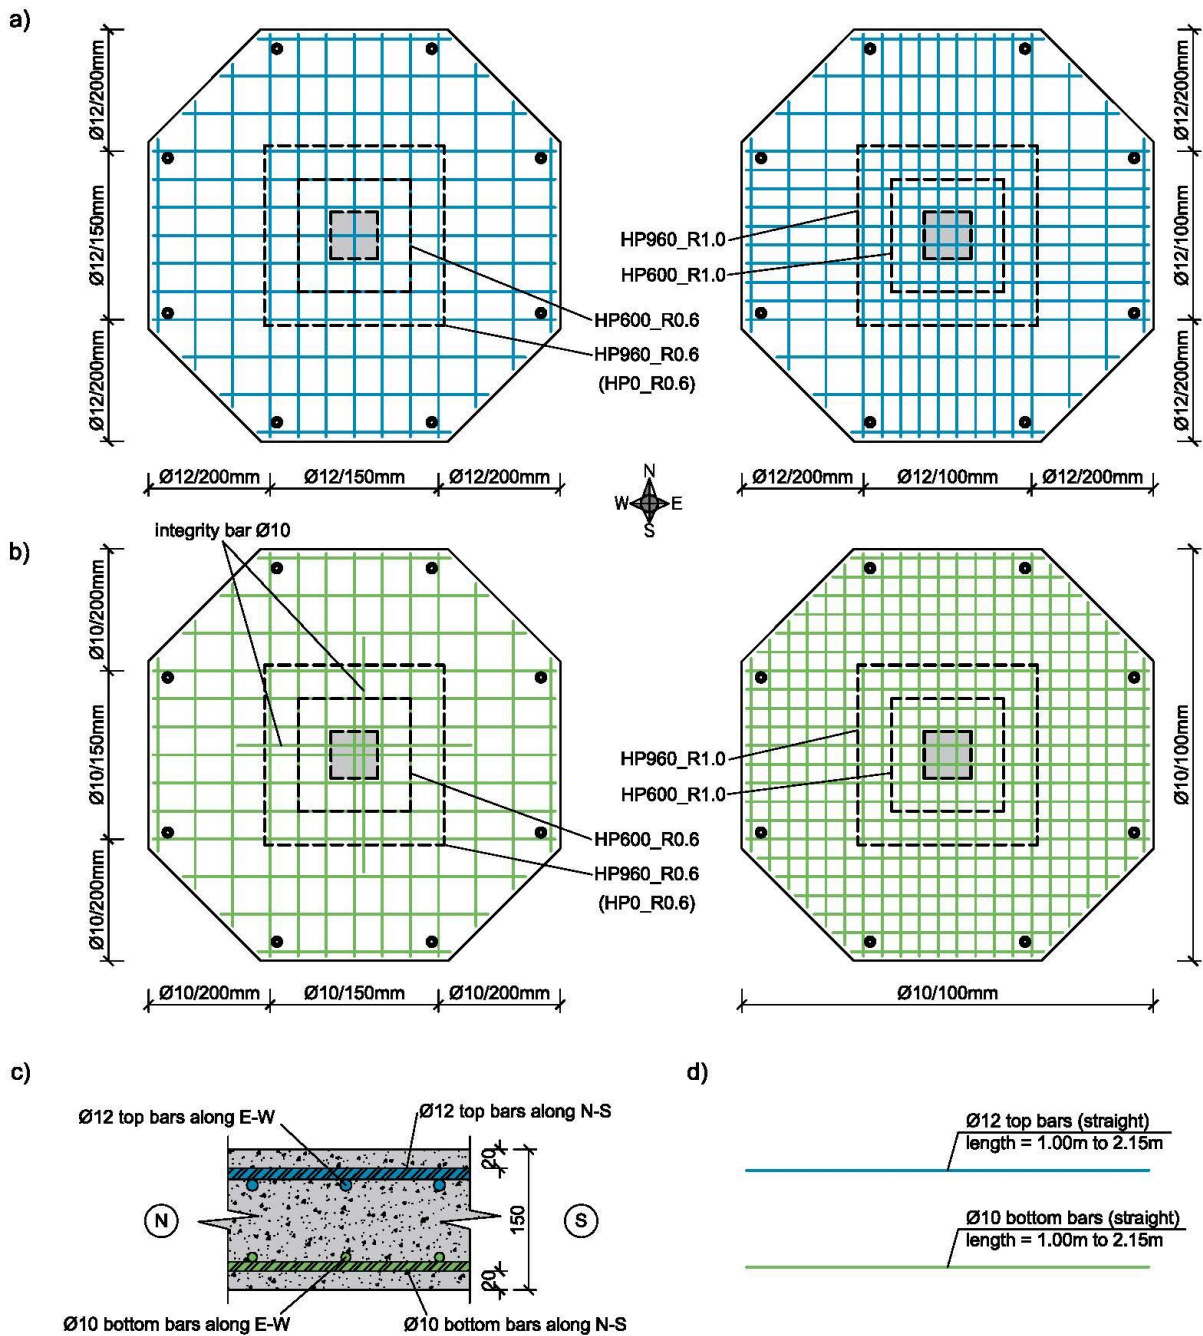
Flexural reinforcement: a) top rebars; b) bottom rebars; c) cross-section detail; d) reinforcement detail
